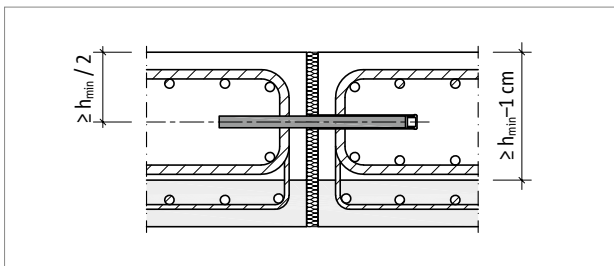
Schöck Stacon® type LD: Arrangement of on-site reinforcement in half-precast slabs
